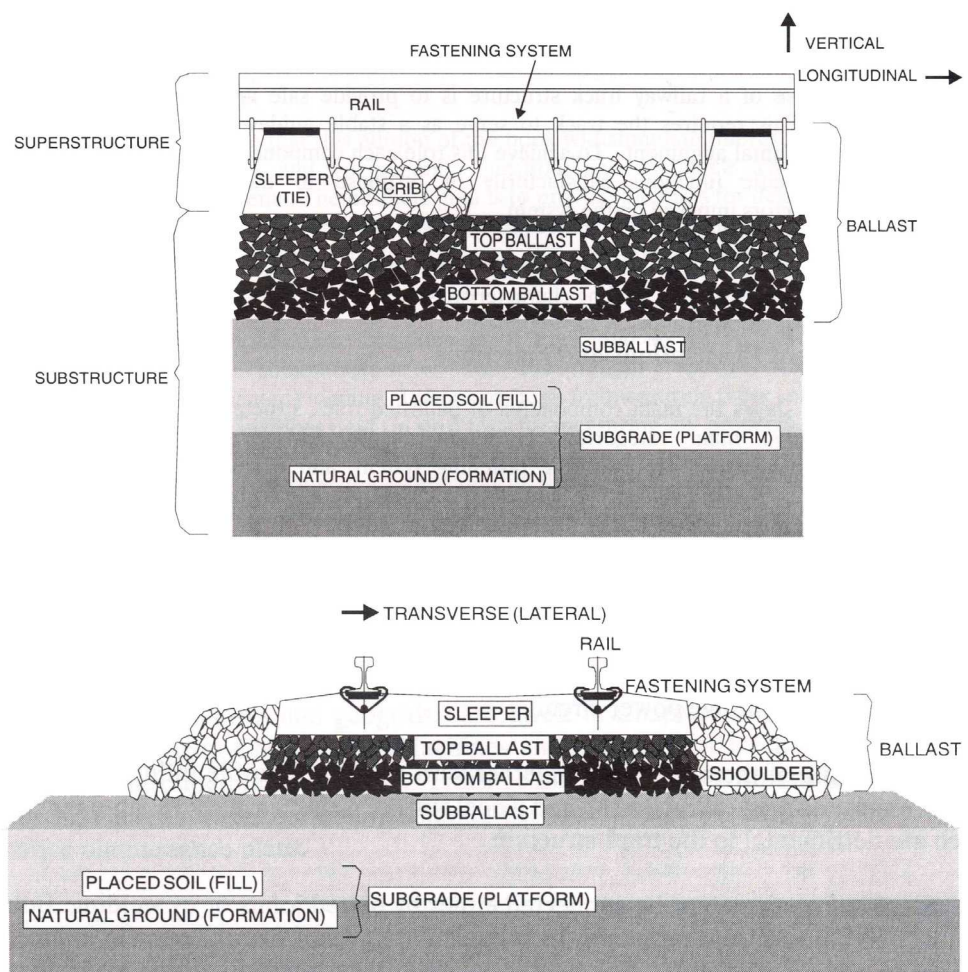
Layout of a typical ballasted track (Selig and Waters, 1994)
